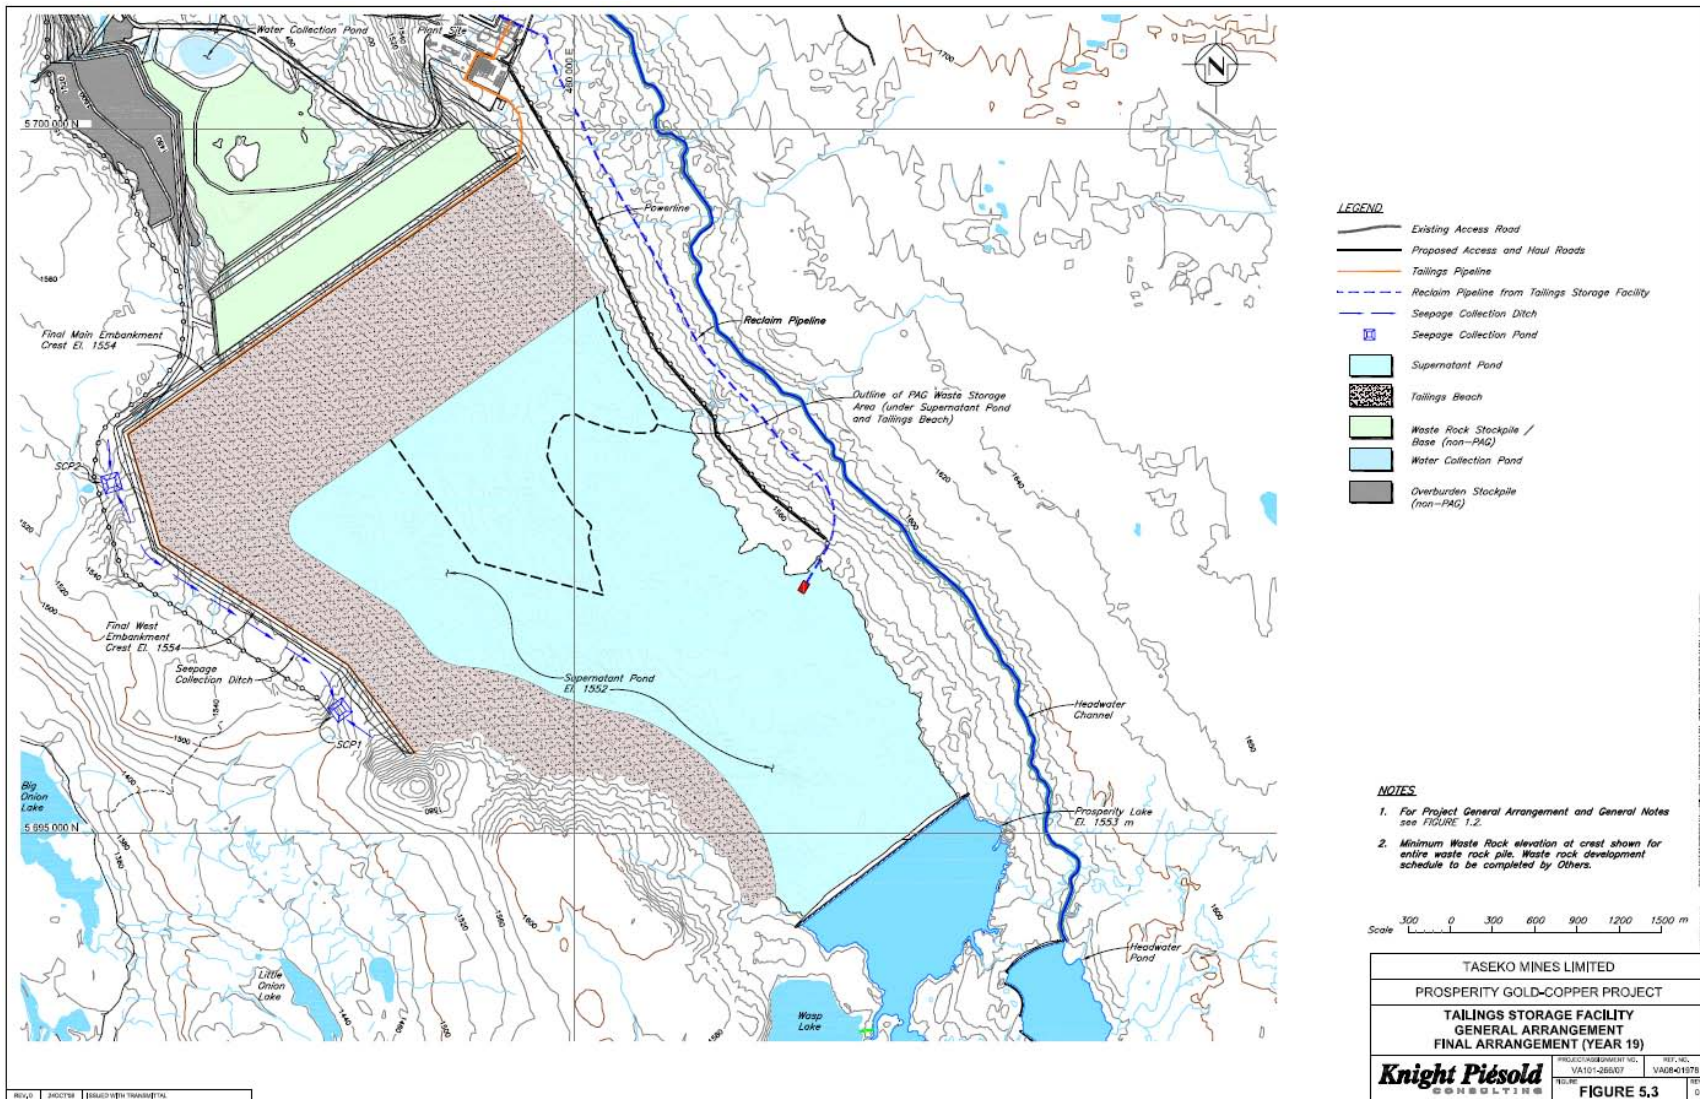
Tailings Storage Facility General Arrangement–Final Arrangement
